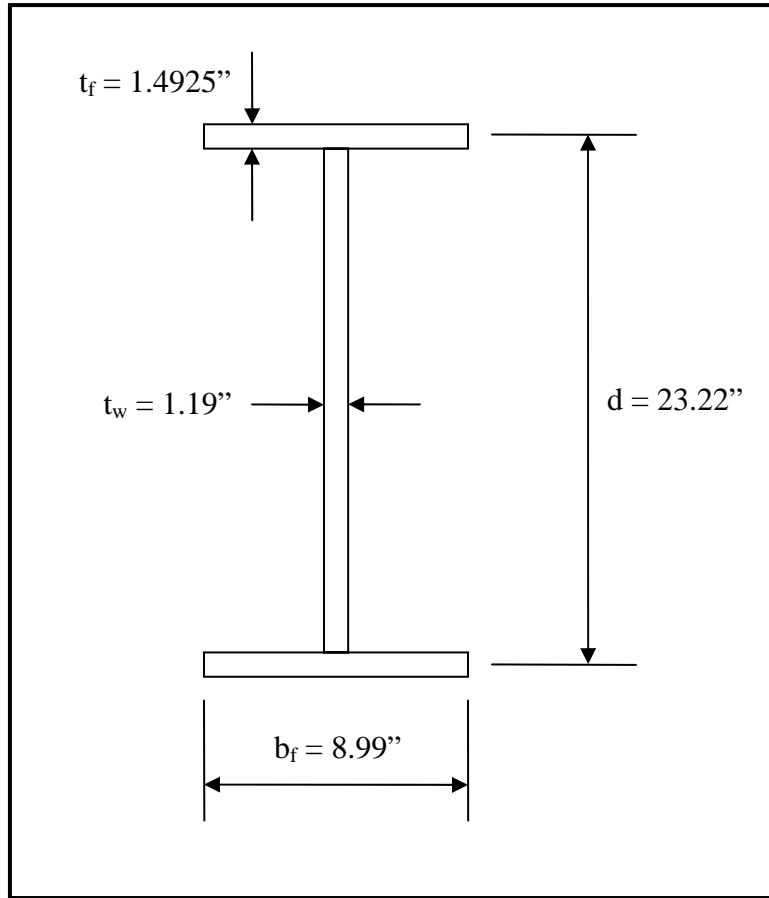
Cross-sectional geometry of basic W24x76 girder with splice plates.
